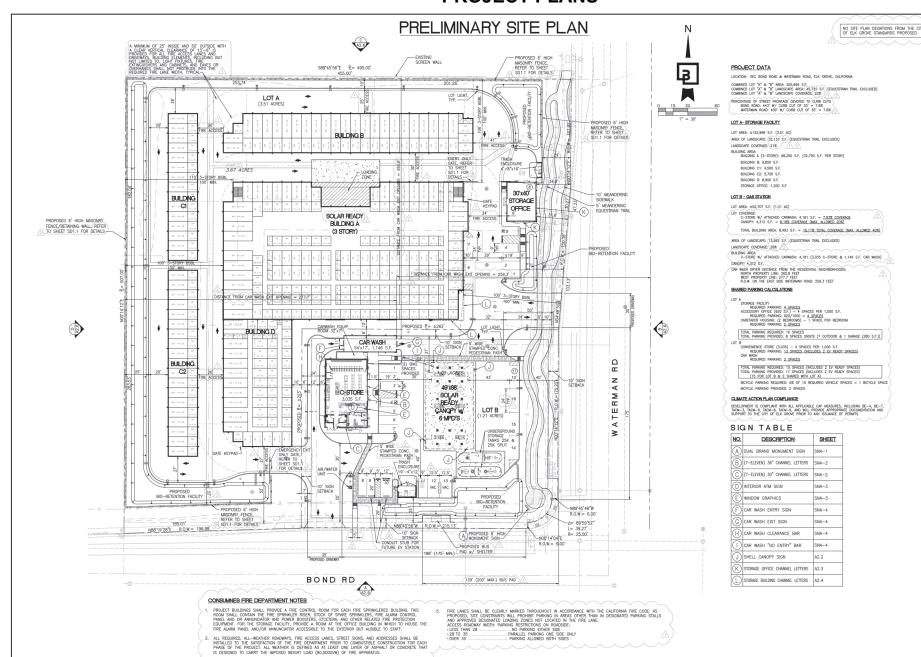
# Exhibit A Bond and Waterman Shell with 7-Eleven and Storage Facility (APLA21-001) Project Description
